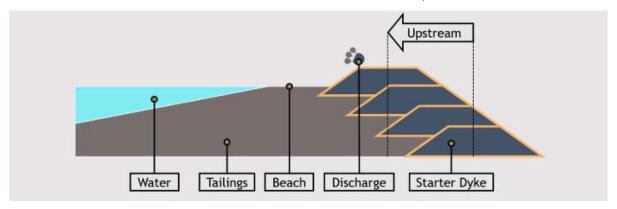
Upstream Tailing Storage Facility design (Yanama Gold, 2023)
